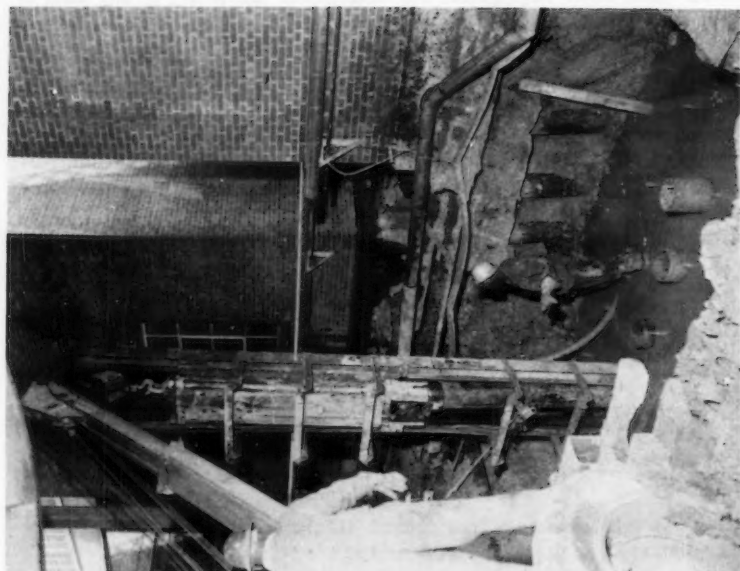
FOUNDATION—RING 59, 19-FOOT PRESSURE TUNNEL MODIFICATION
